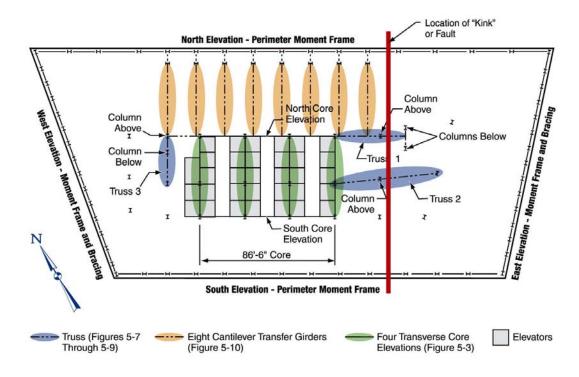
Area of potential transfer truss failure in WTC 7
